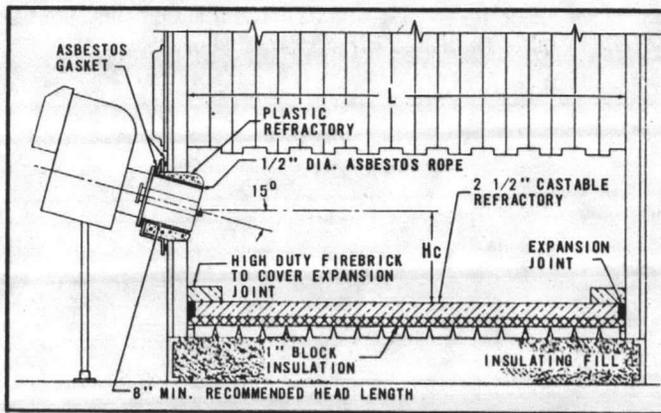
TYPE "R" BURNER INSTALLATION FIRING CAST IRON BOILER WITH SINGLE DOOR
